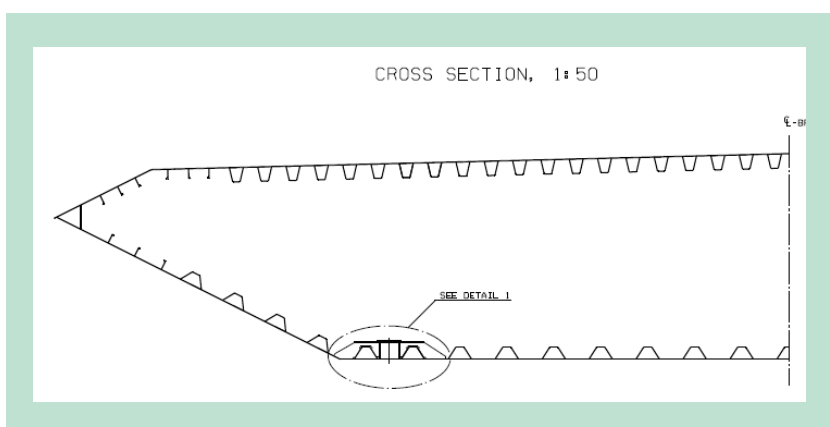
Cross section of the bridge deck, where the measurement inlet is at the marked detail. Source: Sund og Bælt A/S.
